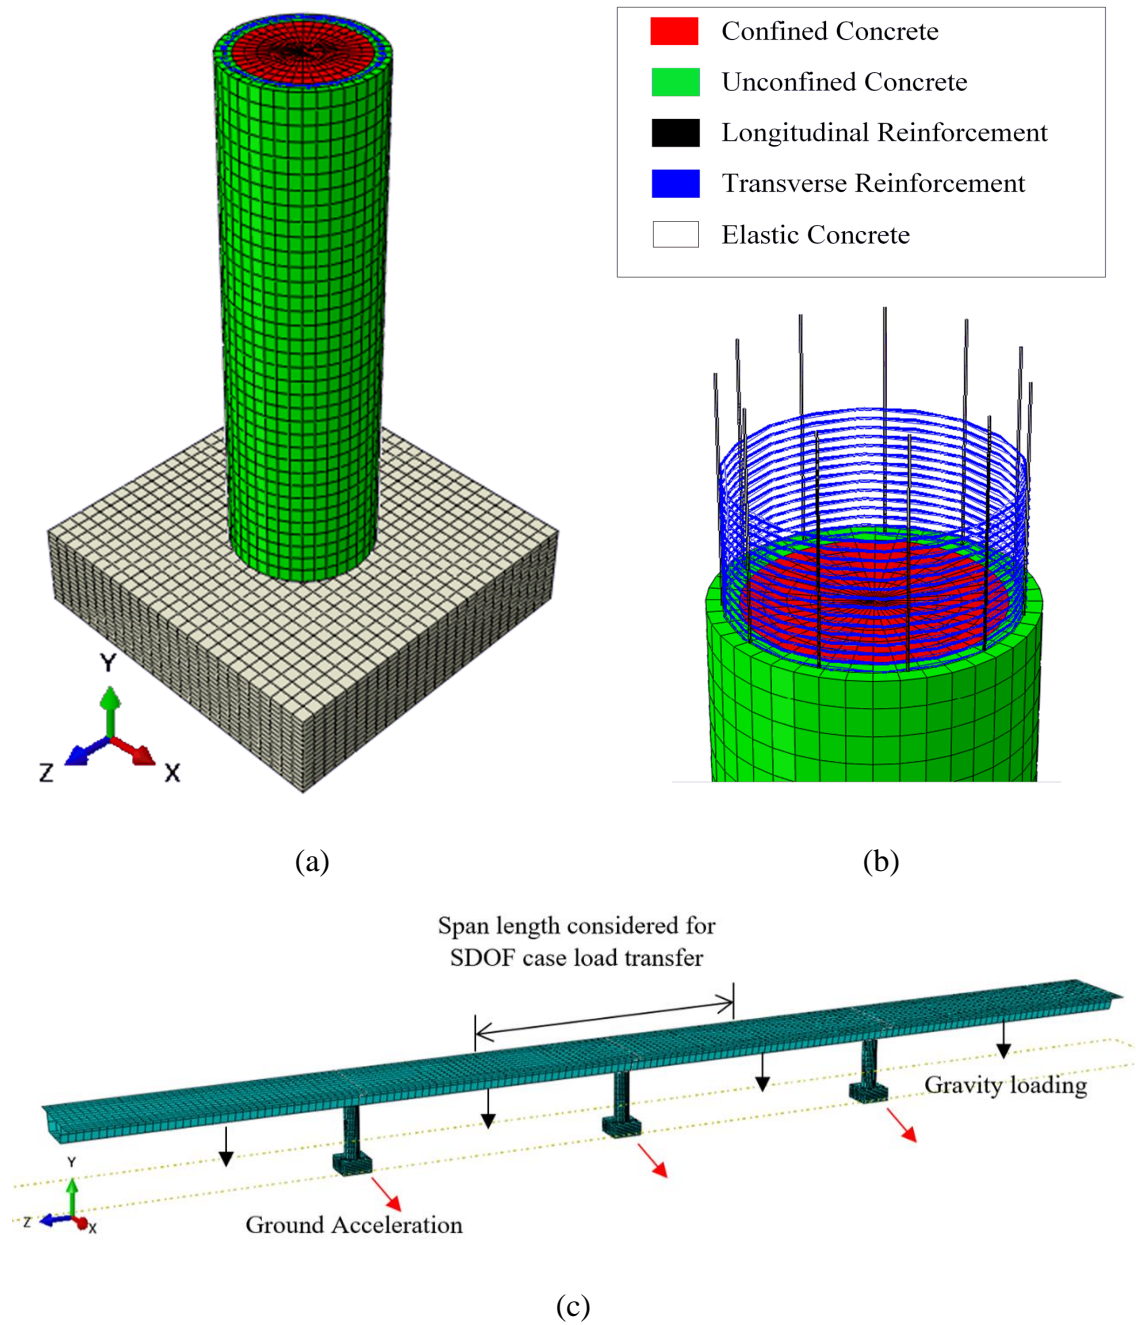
Finite element model (FEM) for a RC bridge: (a) Circular RC bridge pier; (b) Cross-section of the pier; (c) Four-span RC bridge
